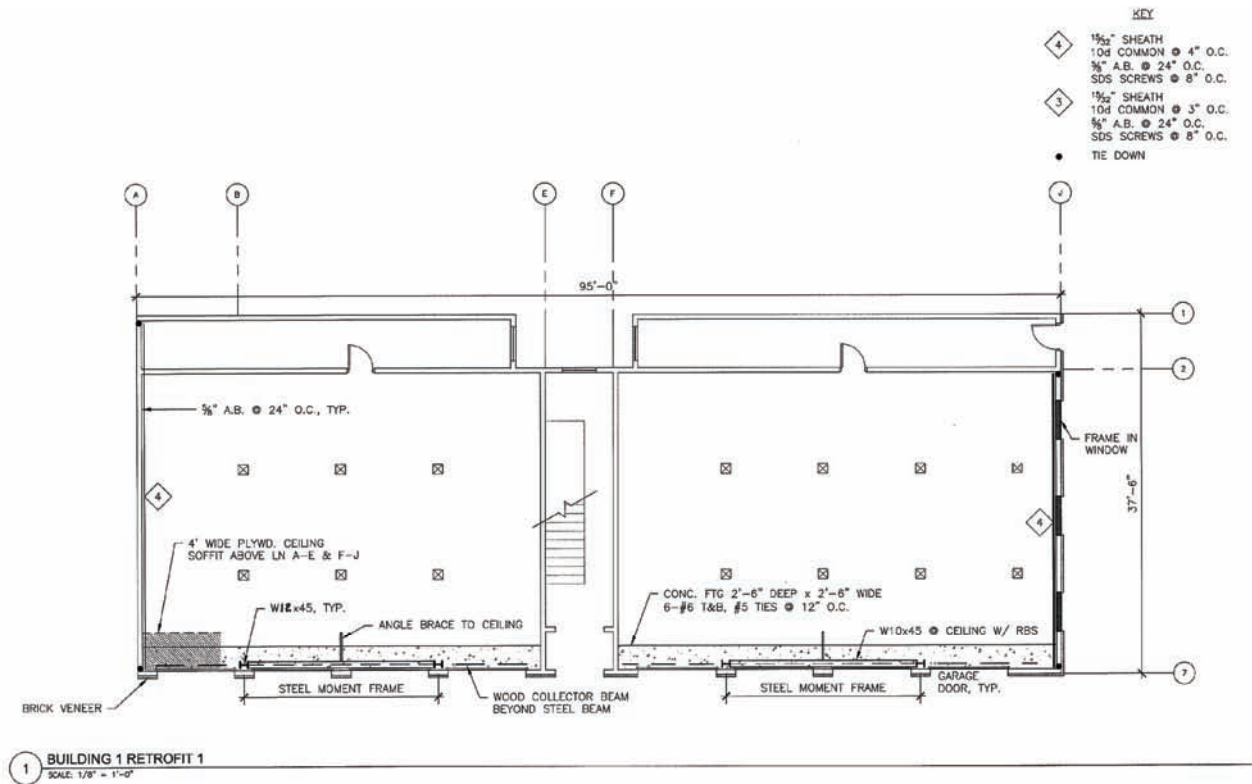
Conceptual Retrofit 1, Index Building 1.
